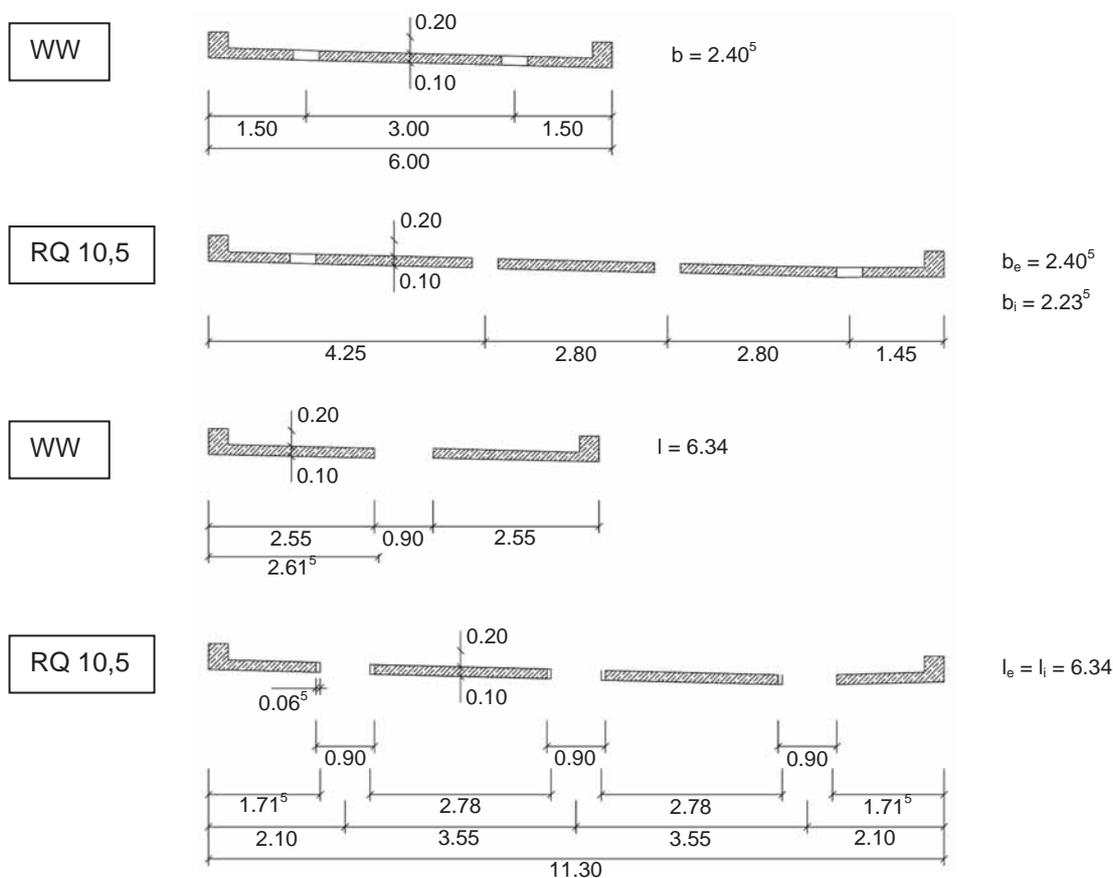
Example cross-sections of large area formwork elements based on [81] for the layouts of Figure 2-42. Dimensions in [m].
